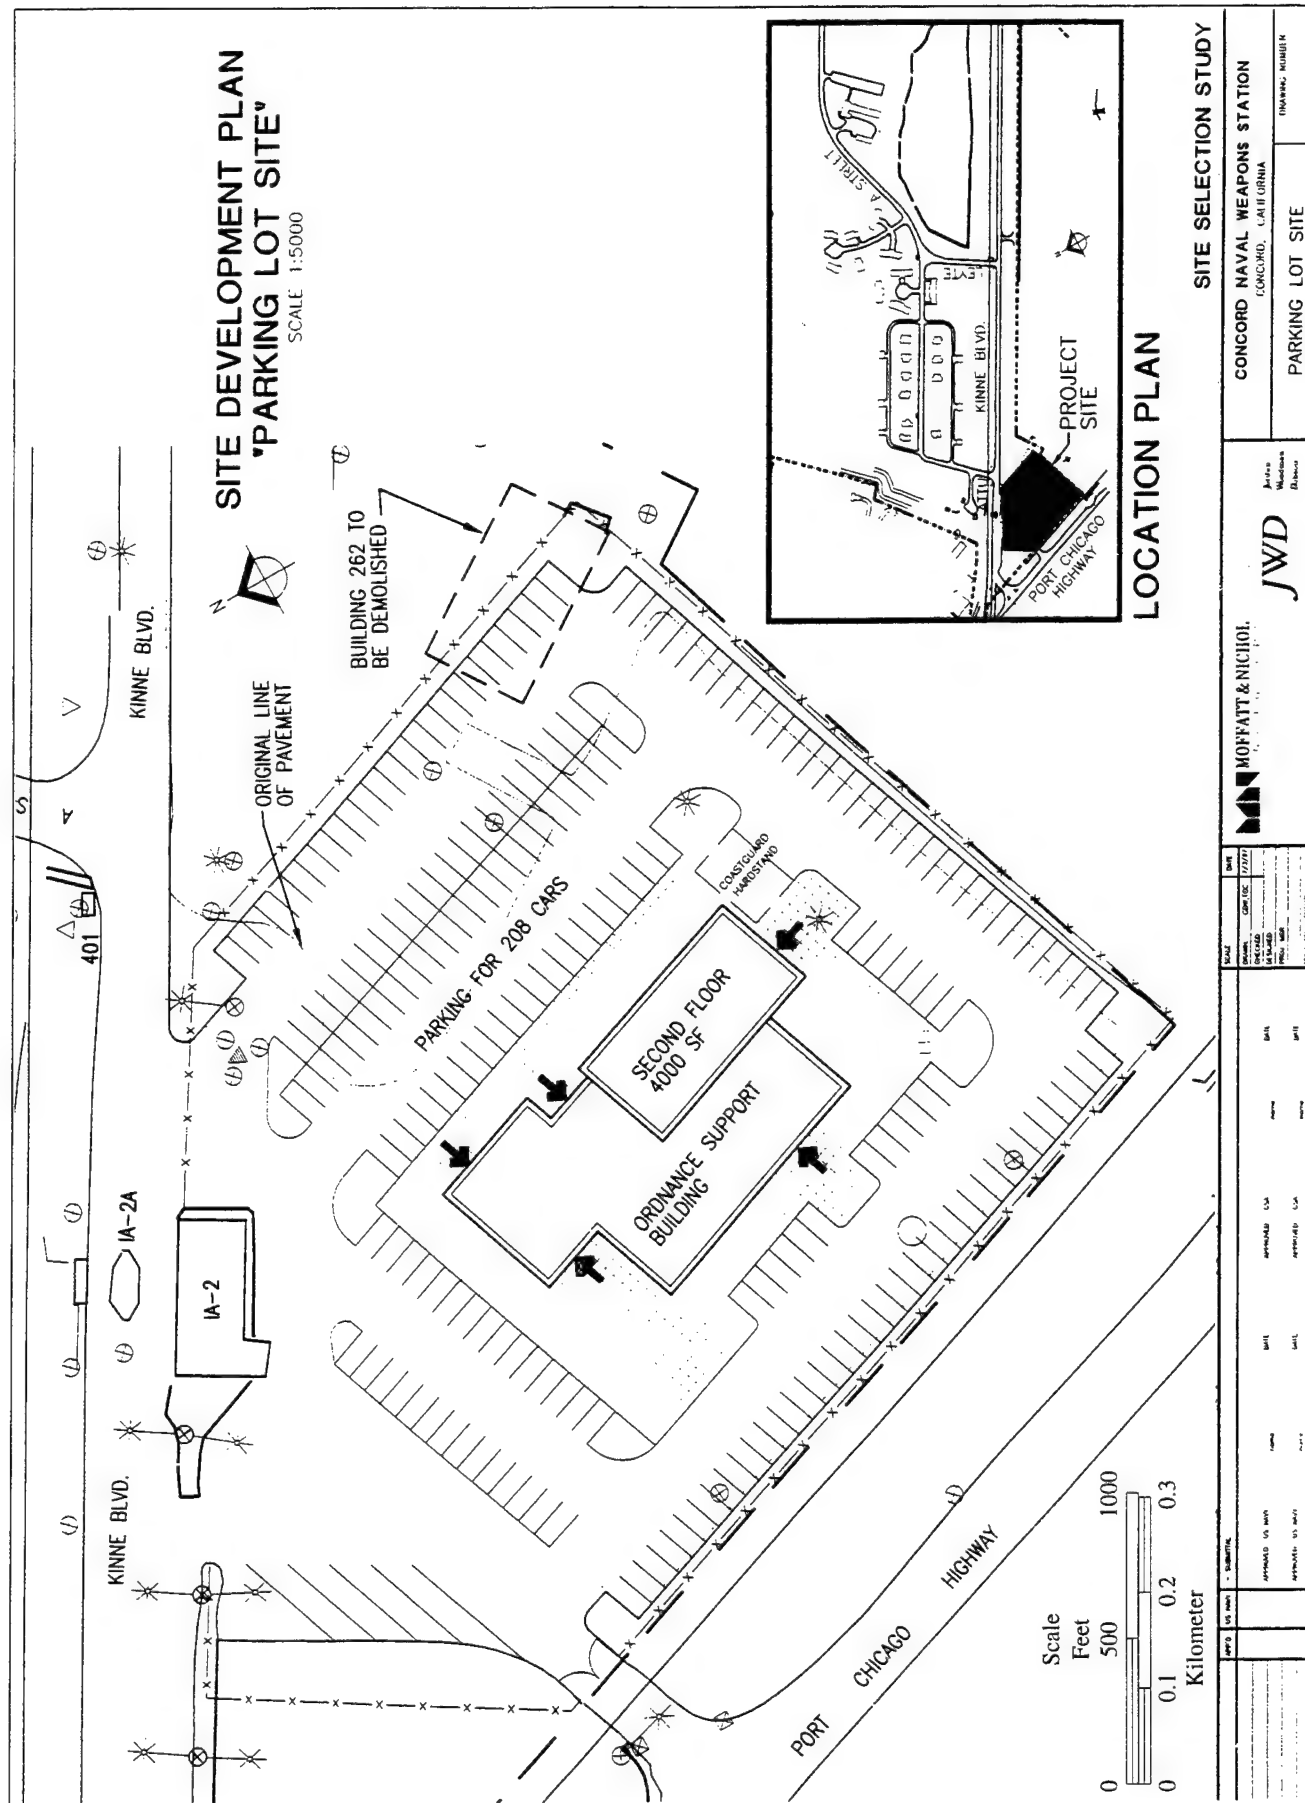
Preliminary Site Development Plan - Parking Lot Site
